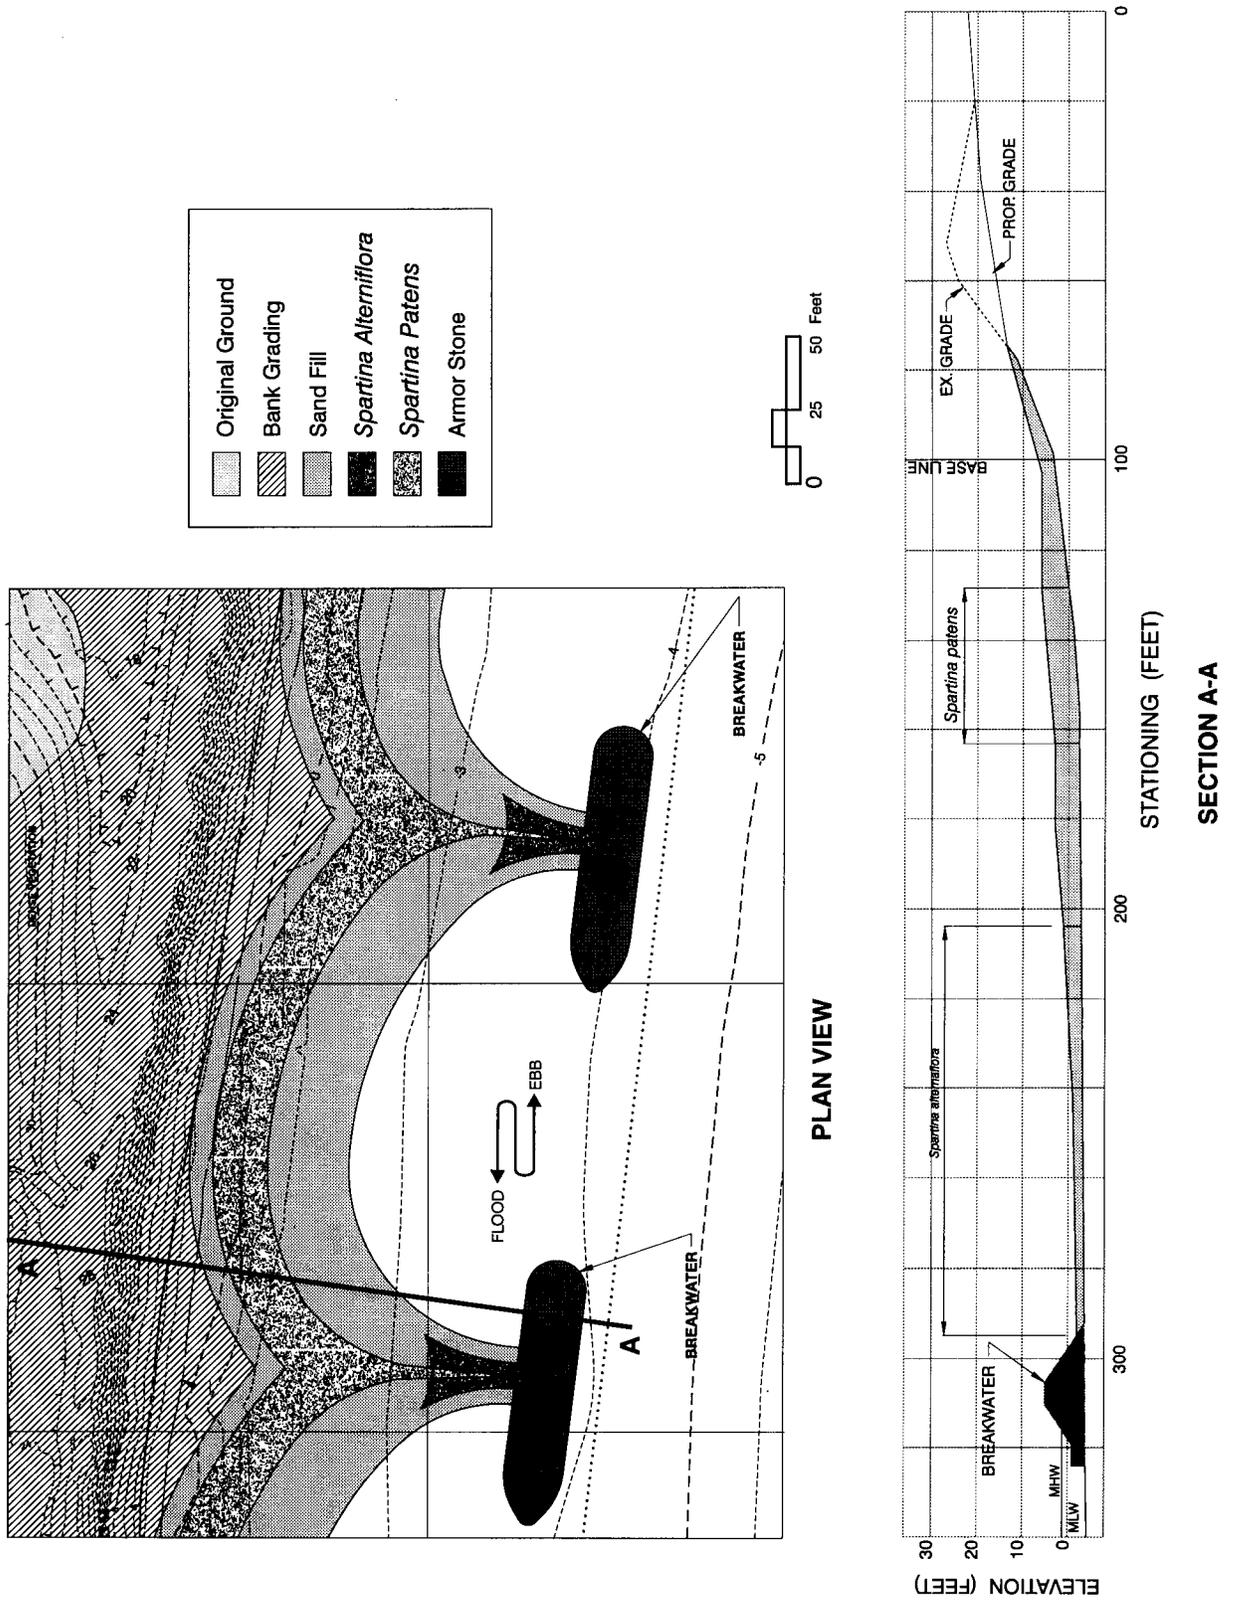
Breakwater: Typical cross-section and plan view. (After (Reynolds and Hardaway, 1995))
